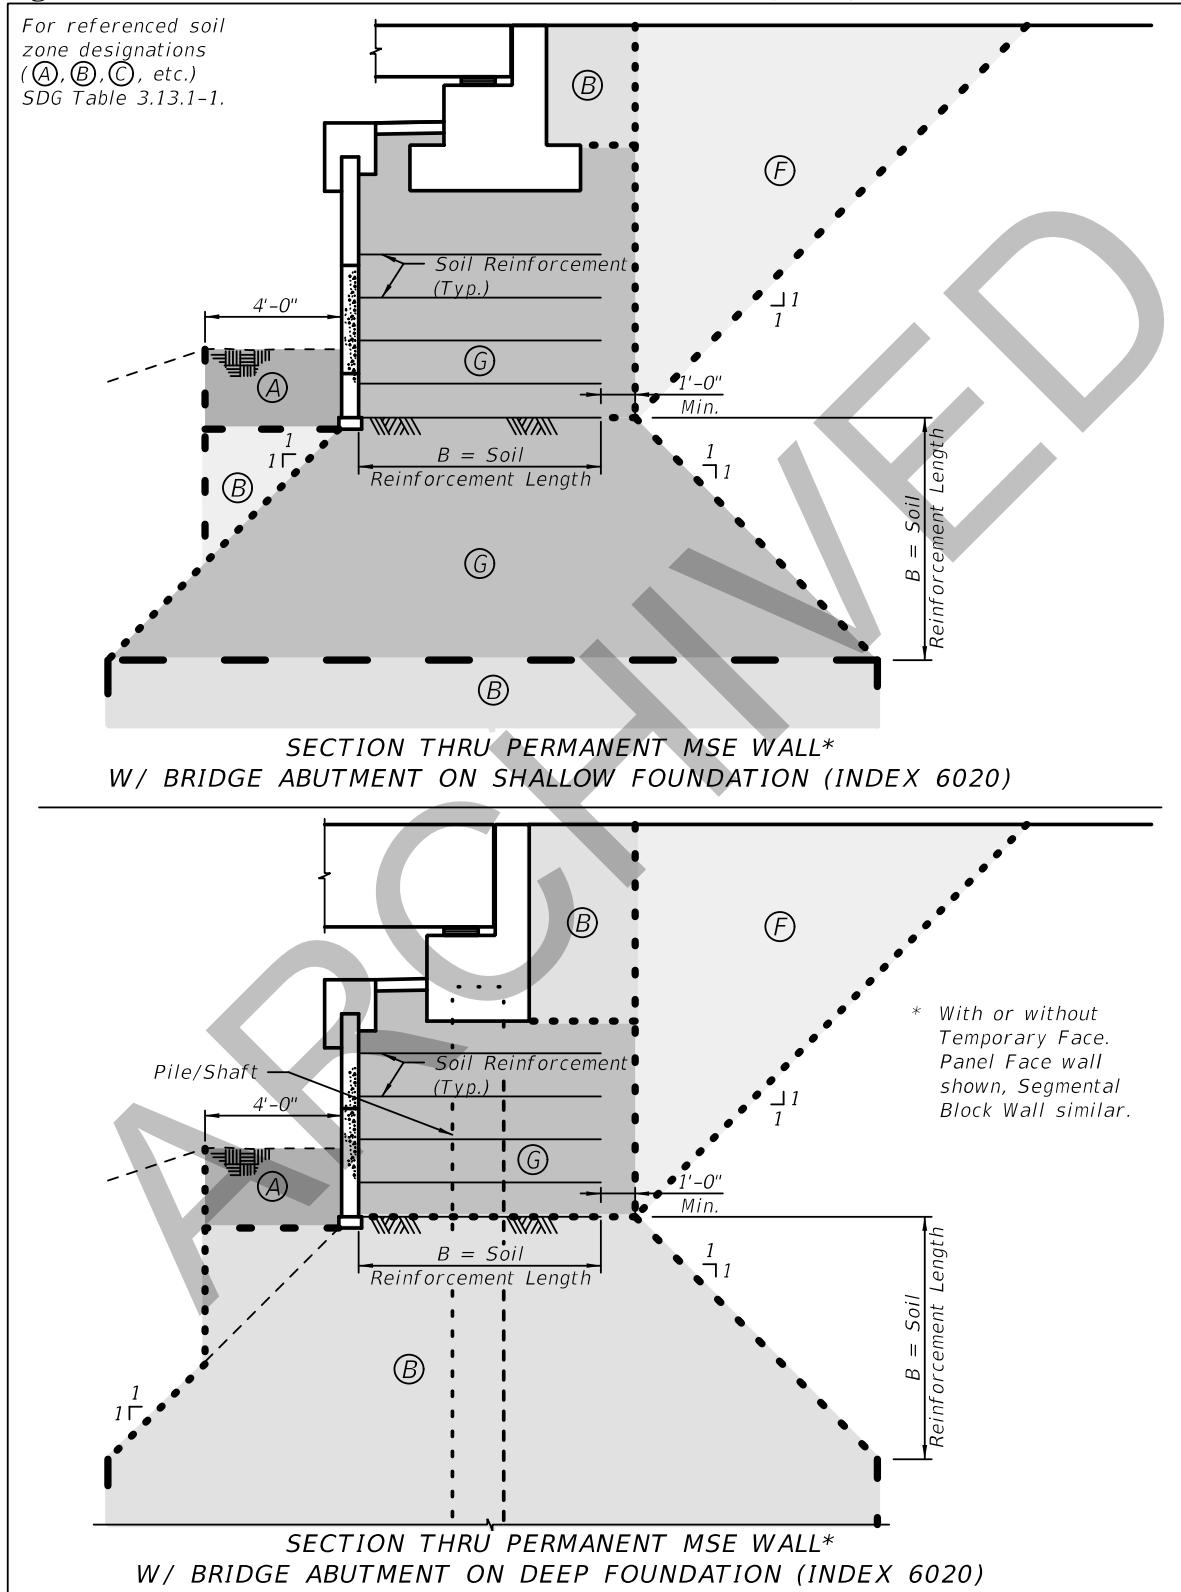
Permanent MSE Wall Soil Zone Details (2 of 2)
